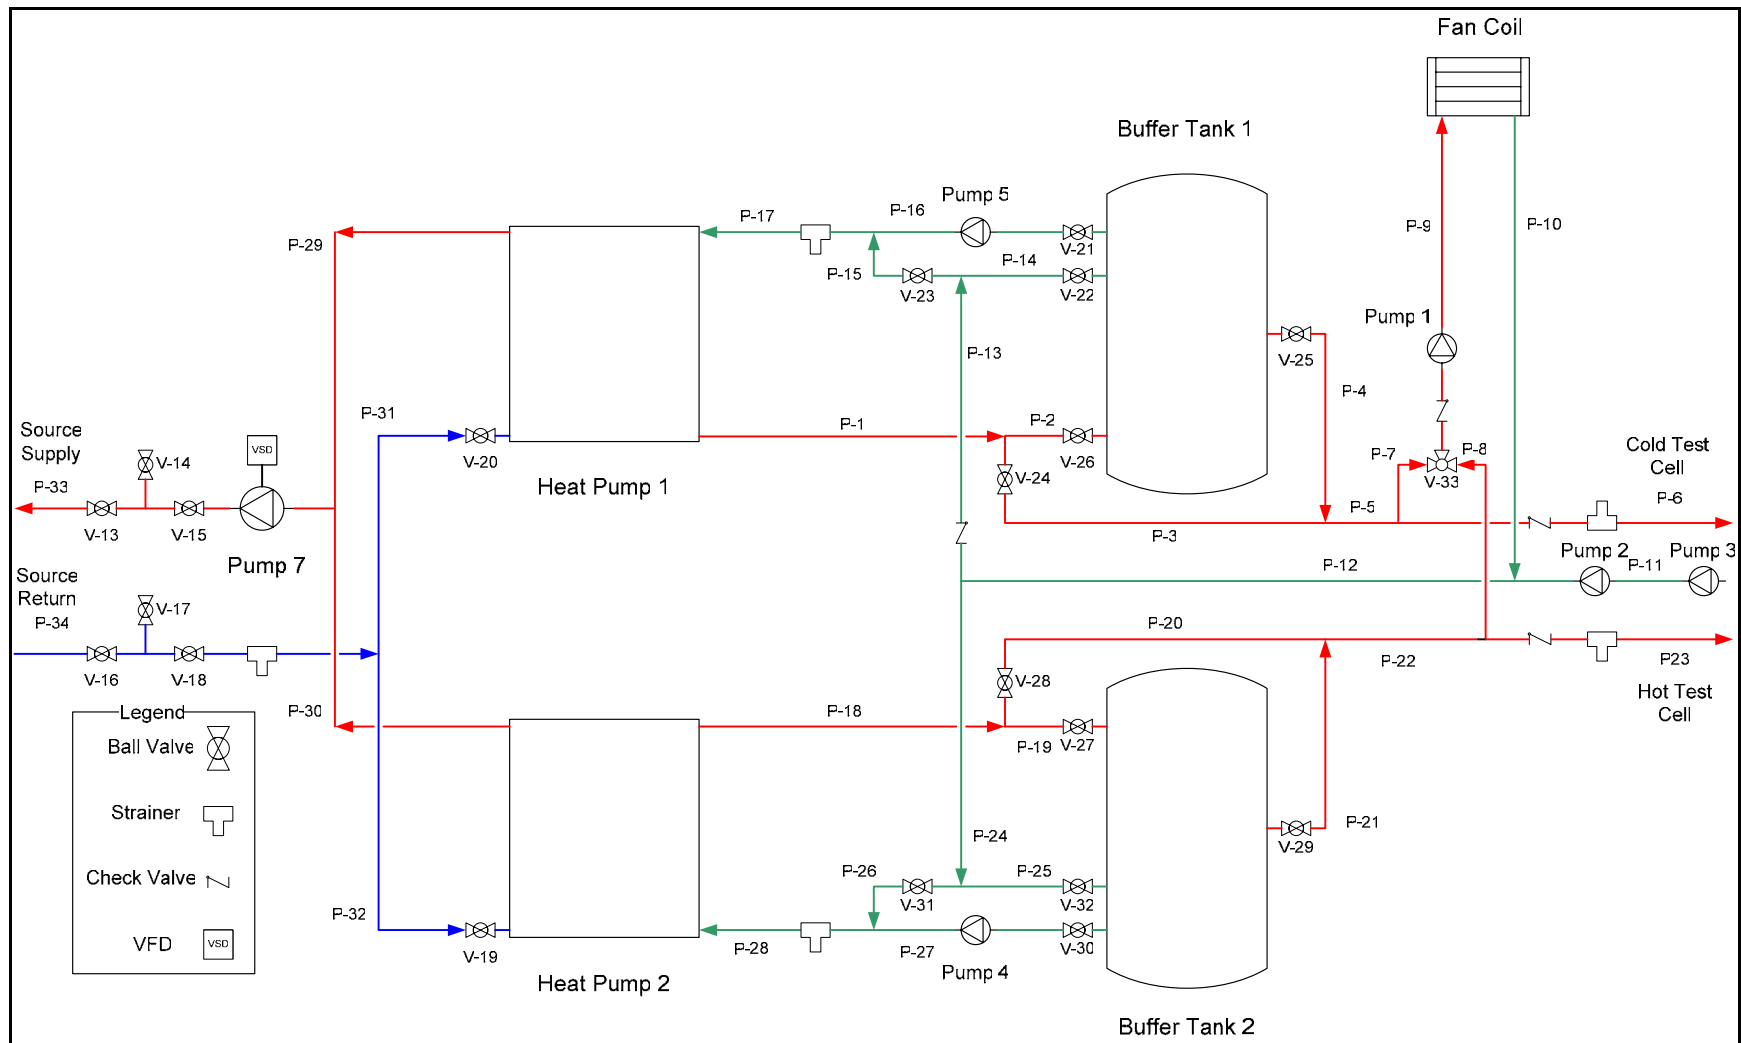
Primary Equipment and Load Side Piping and Valve Schematic
